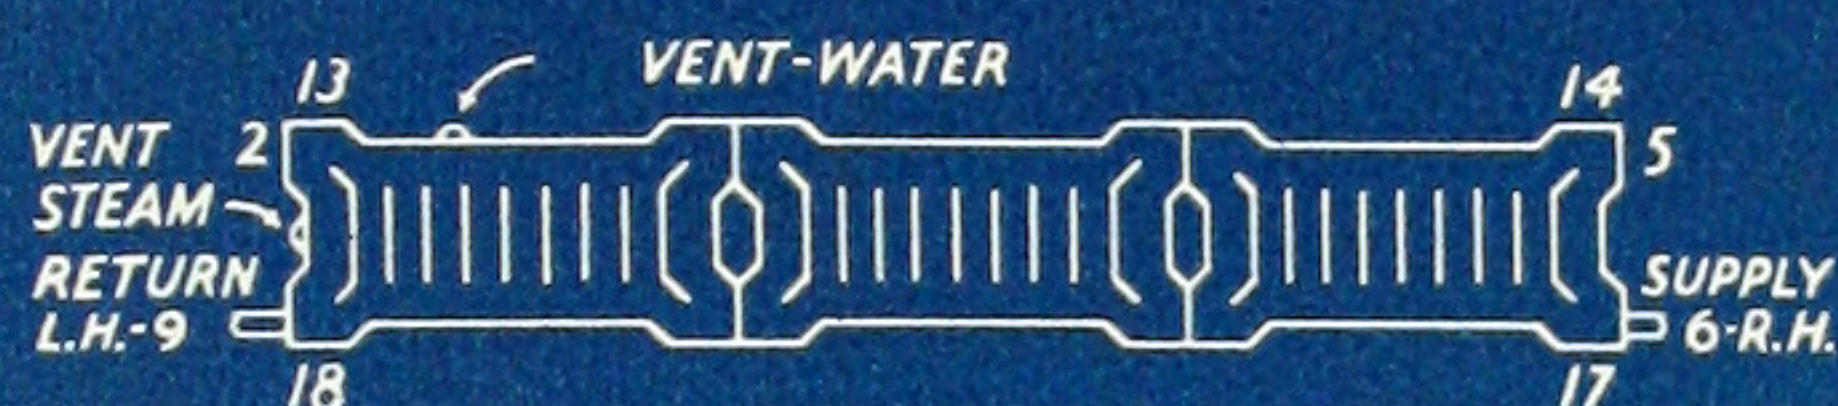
Assembled in single tier. Water or one and two pipe steam.
